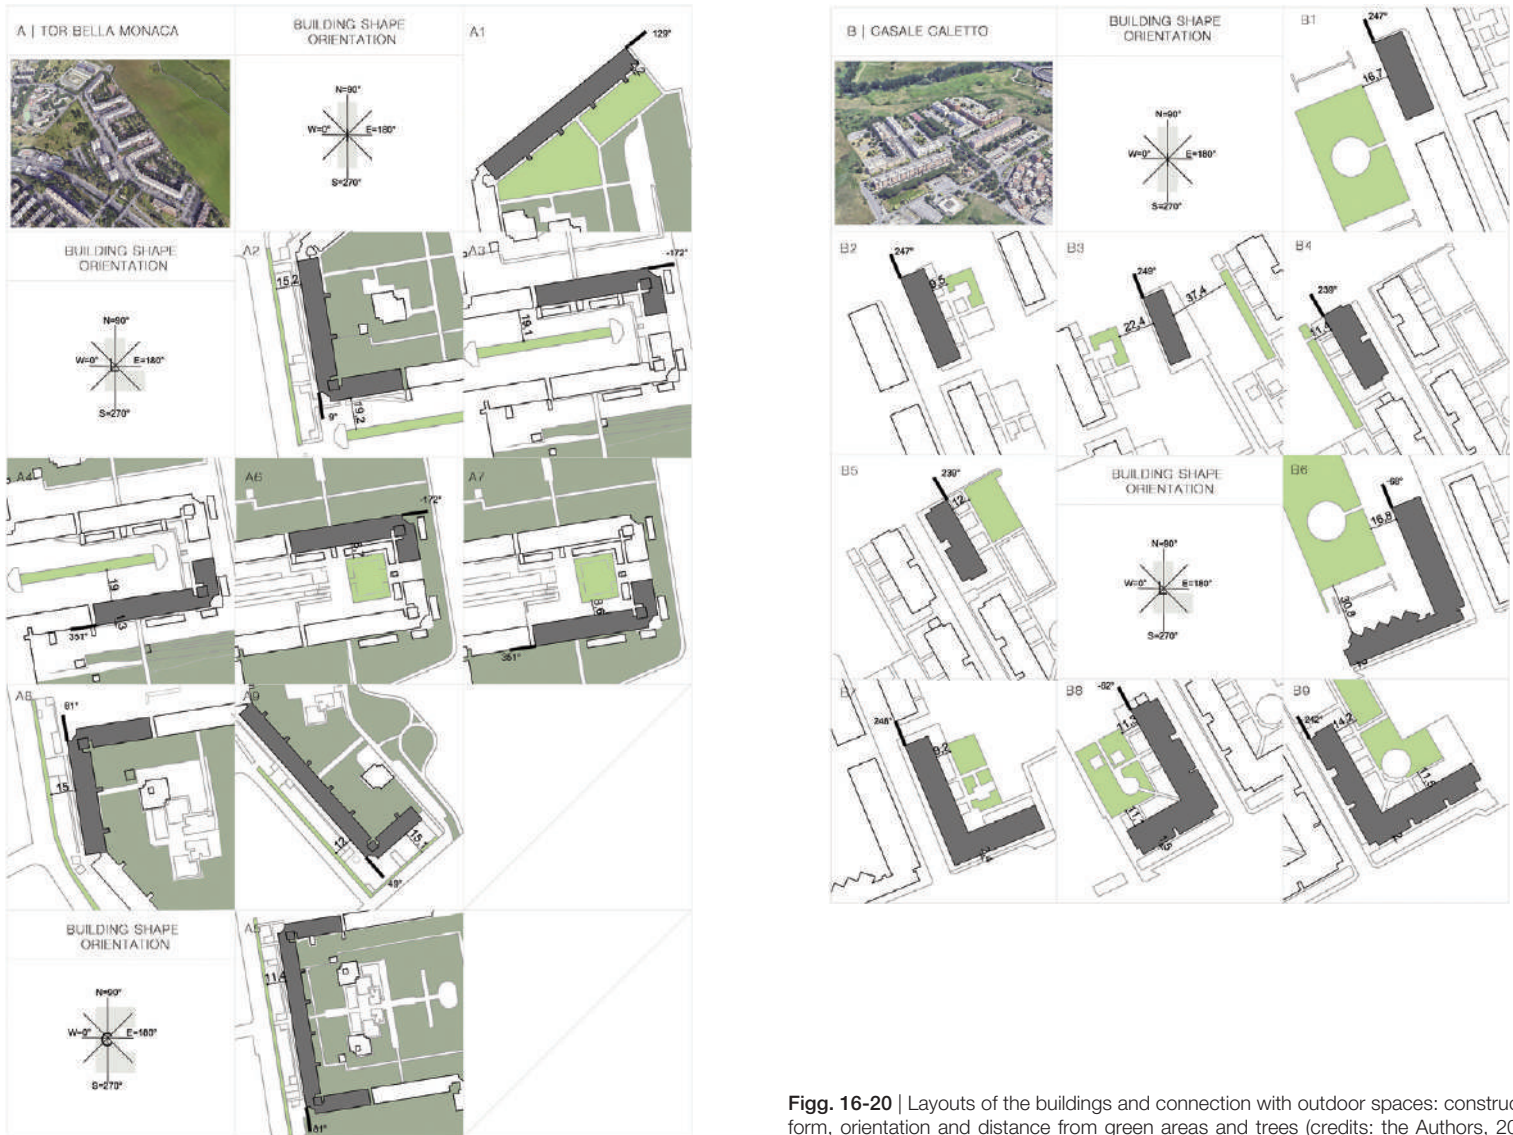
| Layouts of the buildings and connection with outdoor spaces: construction form, orientation and distance from green areas and trees (credits: the Authors, 2022).
